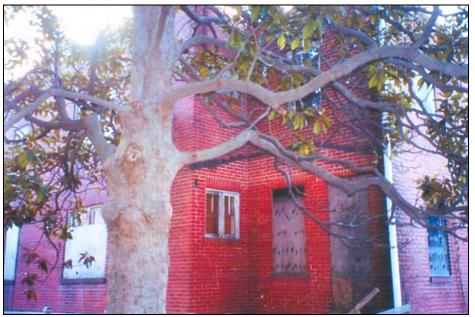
Location of proposed porch at northwest corner of 712 N. Washington Street.
